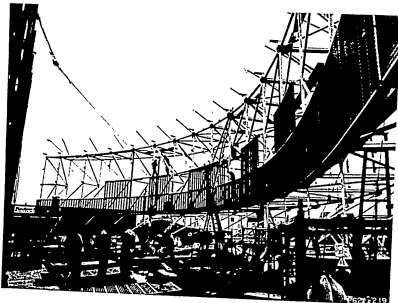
Installing panels on reflector truss. Alignment was made with piano wires and optical tooling.
